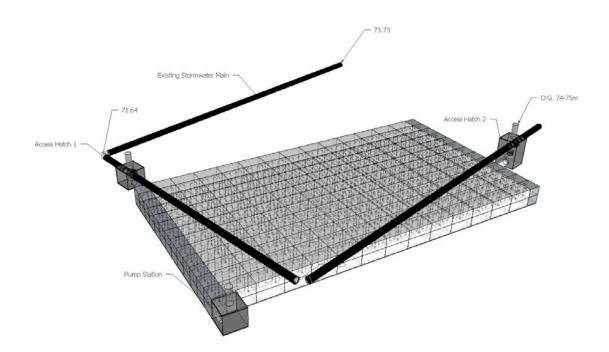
Schematic Layout of StormTrap Modules With Existing Stormwater Mains
